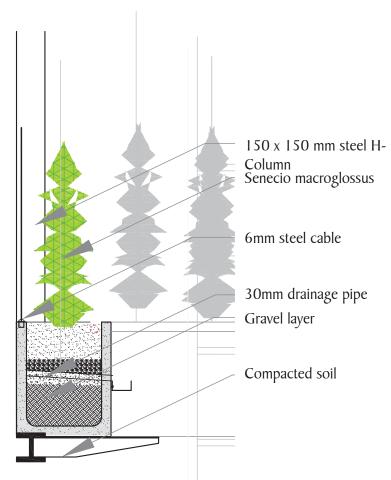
Detail: Vertical garden(Author, 2008) Scale 1: 20
